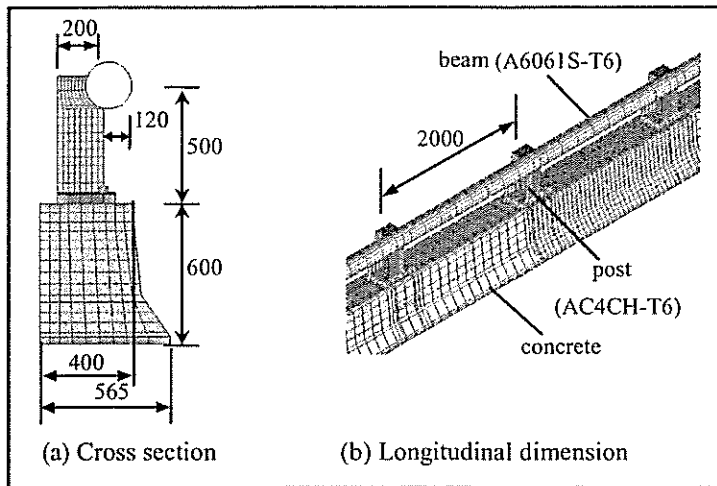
FEM Models of an Aluminum Alloy-Concrete Guard Fence (unit: mm)
